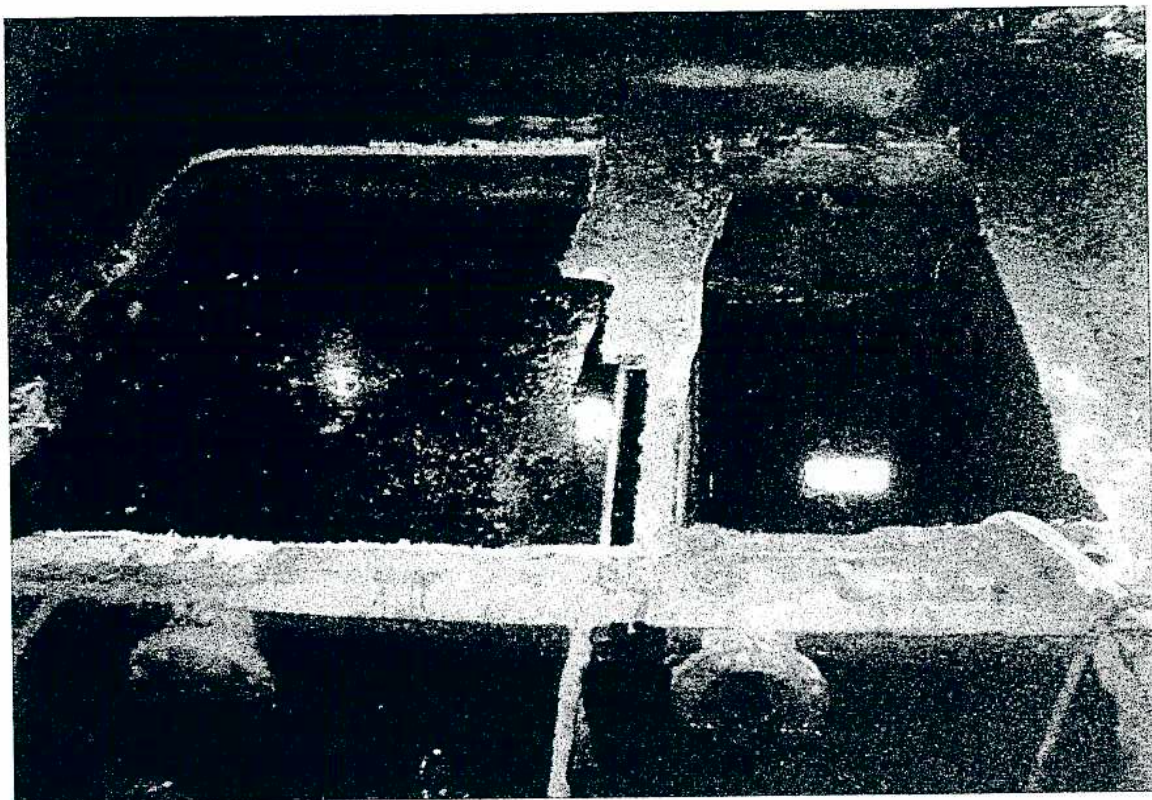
View of opened polyethylene tank from Building 4 Pit.
